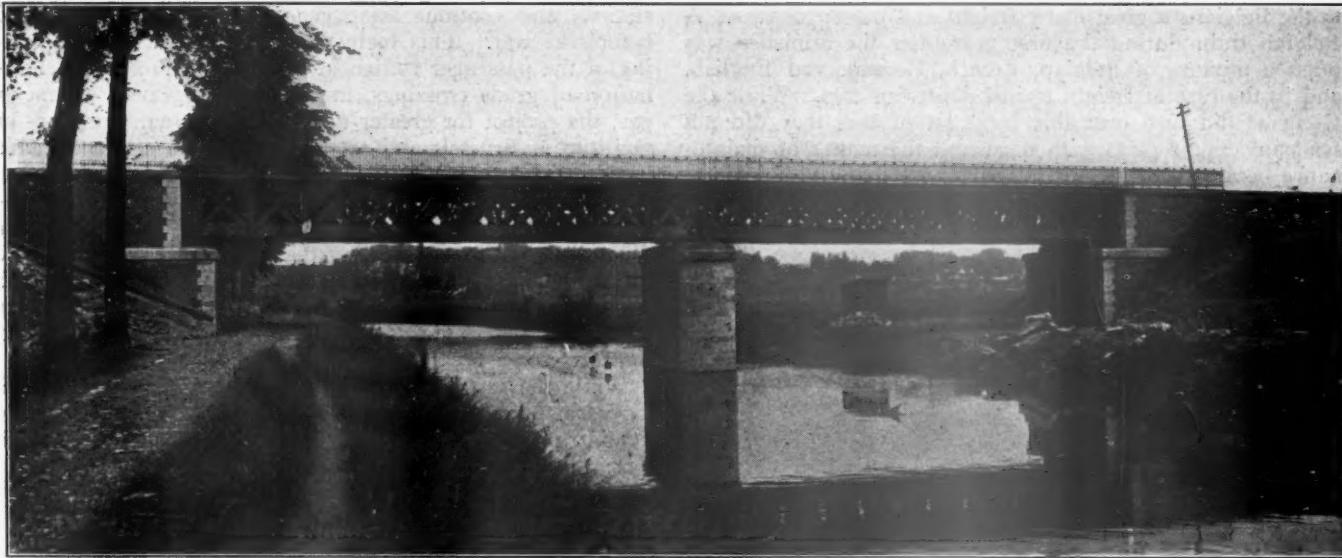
Sambre Bridge. The Trestle Bridge Replacing the Temporary Structure in Fig. 2.
